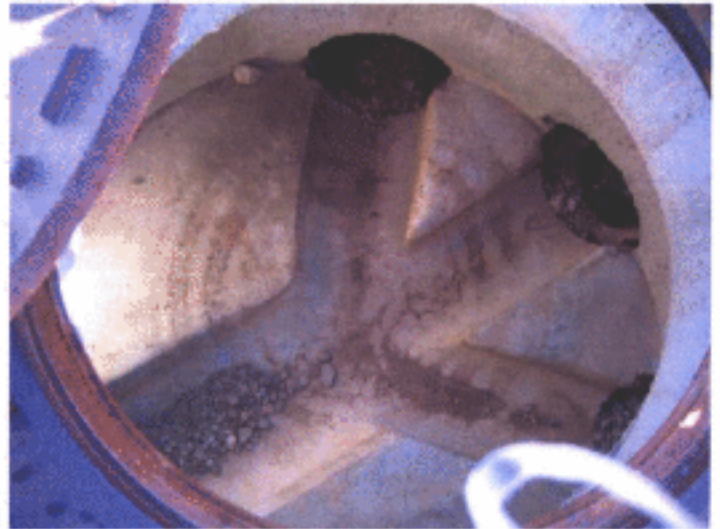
Manhole/Drain D at the base of the caps west slope 5/23/07
